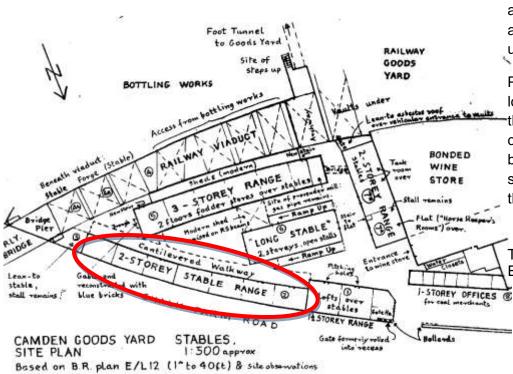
1975 plan with 'site observations' noted. The west end of the Chalk Farm building (the subject site and highlighted in red) is noted as the Gate House and the site sliding entrance gate (which was housed within the building) is shown and noted.
